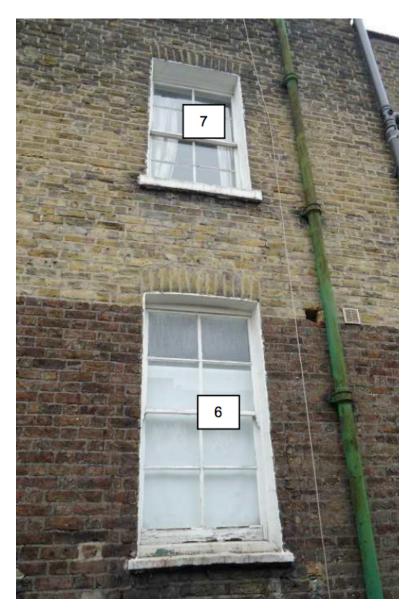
Rear elevation of 6 Pratt Street (Listed Building)
